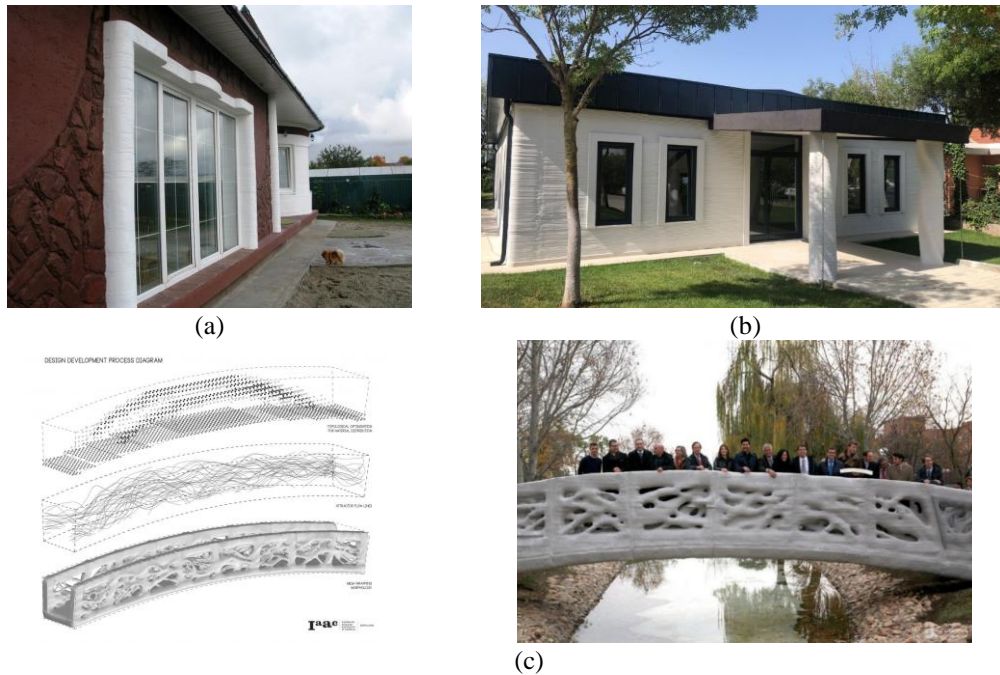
(a) The Material Used to Build the Yaroslavi House is a Cement-Based Mix Called M-300 Sand Concrete. [13]; (B) The First 3DPC Structure in Turkey Built by ISTON; (C) The First 3D Printed Footbridge of Alcobendas [14]
